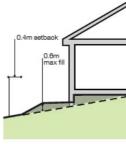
FILL AND EXCAVATION WITH UNPROTECTED EMBANKMENTS
